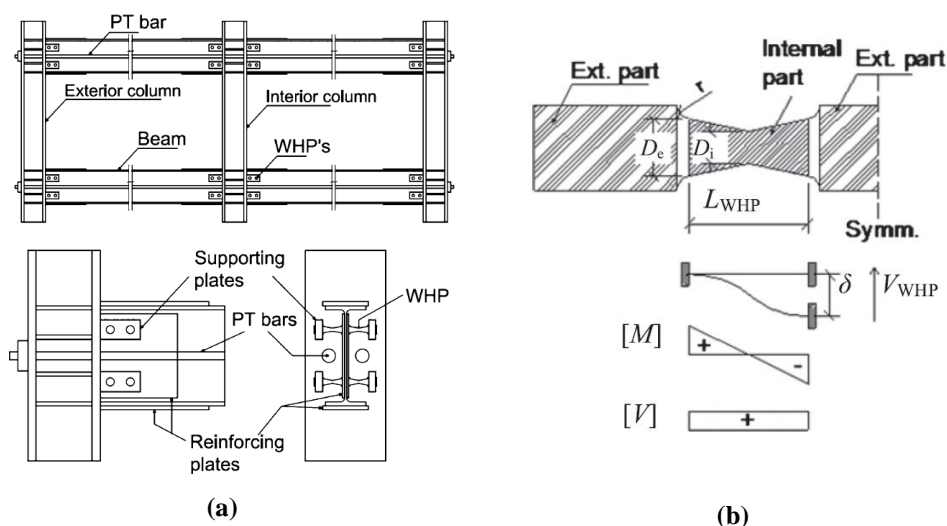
Post-tensioned steel connections with hourglass shape energy dissipater: (a) frame incorporating the proposed PT connection and exterior PT connection details and (b) Geometry of half a WHP, assumed static system, and internal forces diagrams (Vasdravellis et al. 2013^a).
